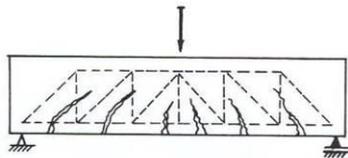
Typical shear failure in prestressed beams without web reinforcement. (Courtesy Prestressed Concrete Institute.)
